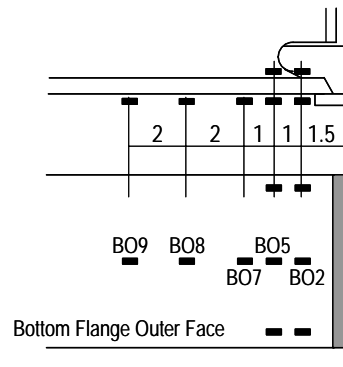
Specimen MWI: Bottom flange outer face (Continued)
